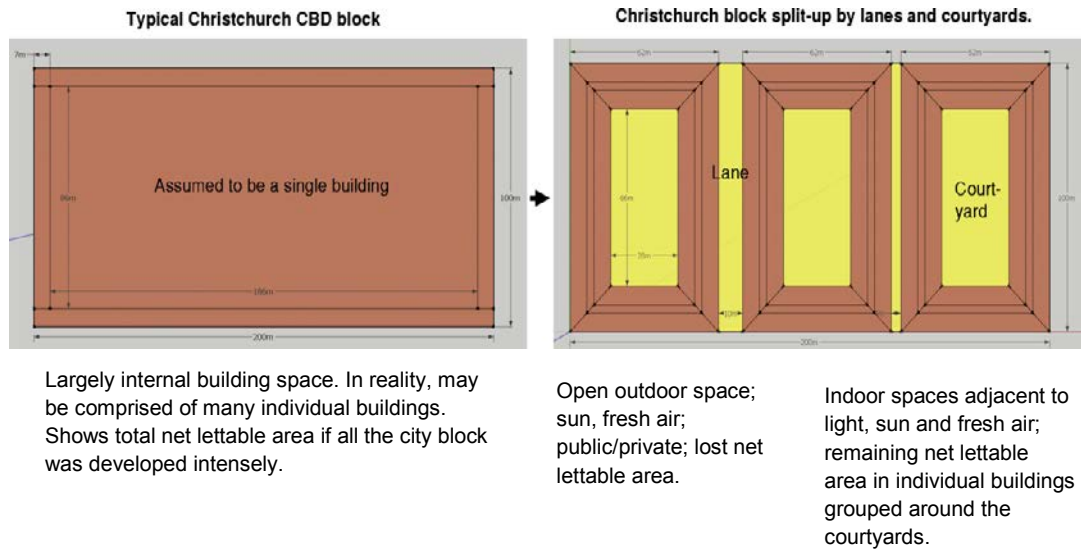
Plan View of City Block with the Central City Plan Urban Form Changes Implemented.
